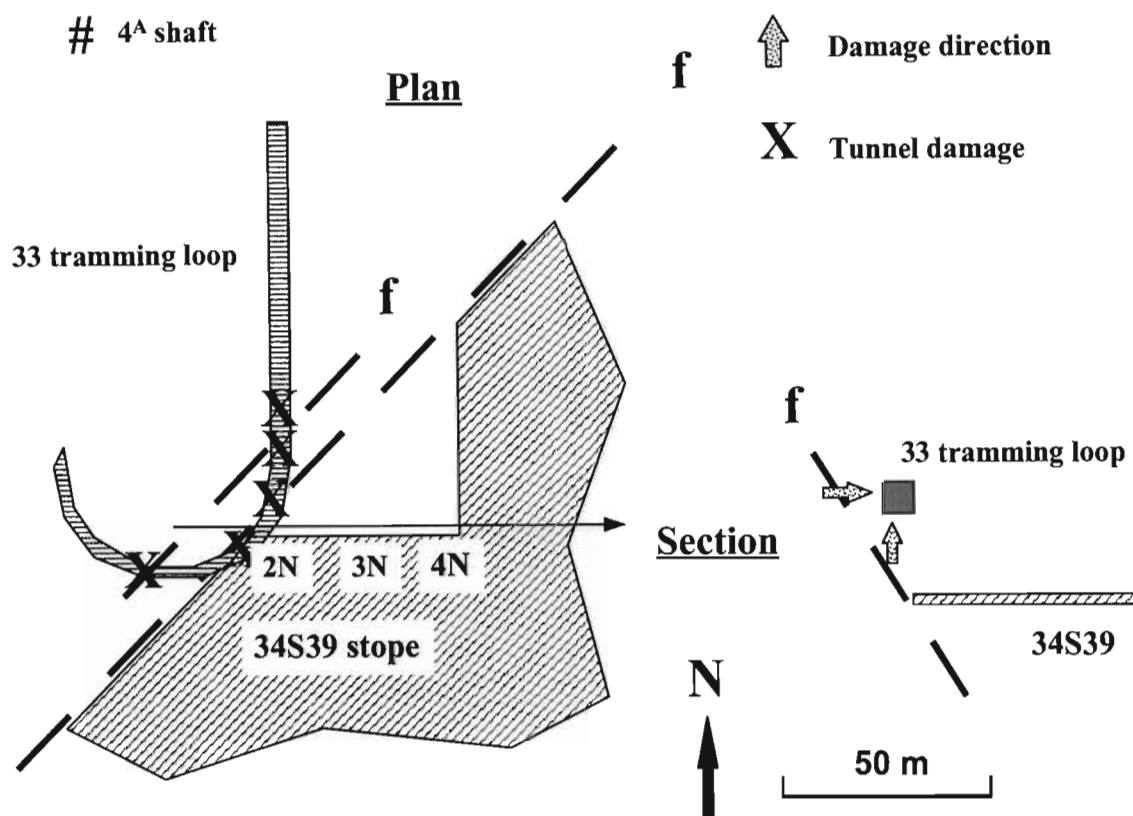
Plan and section of 4^A shaft 33 level tramming loop damage
